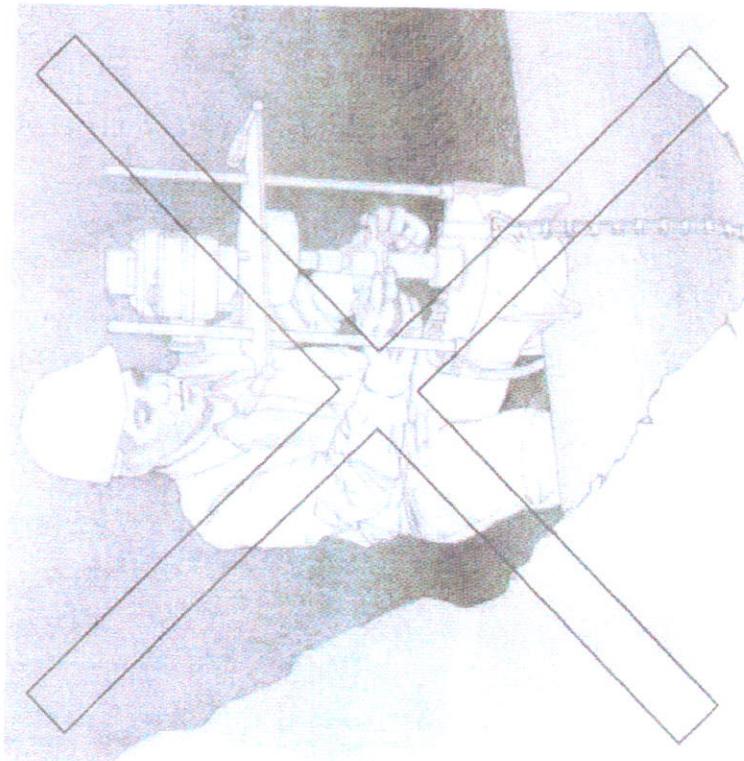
Shell cutters should not be used to cut entry holes in asbestos-cement pipe
